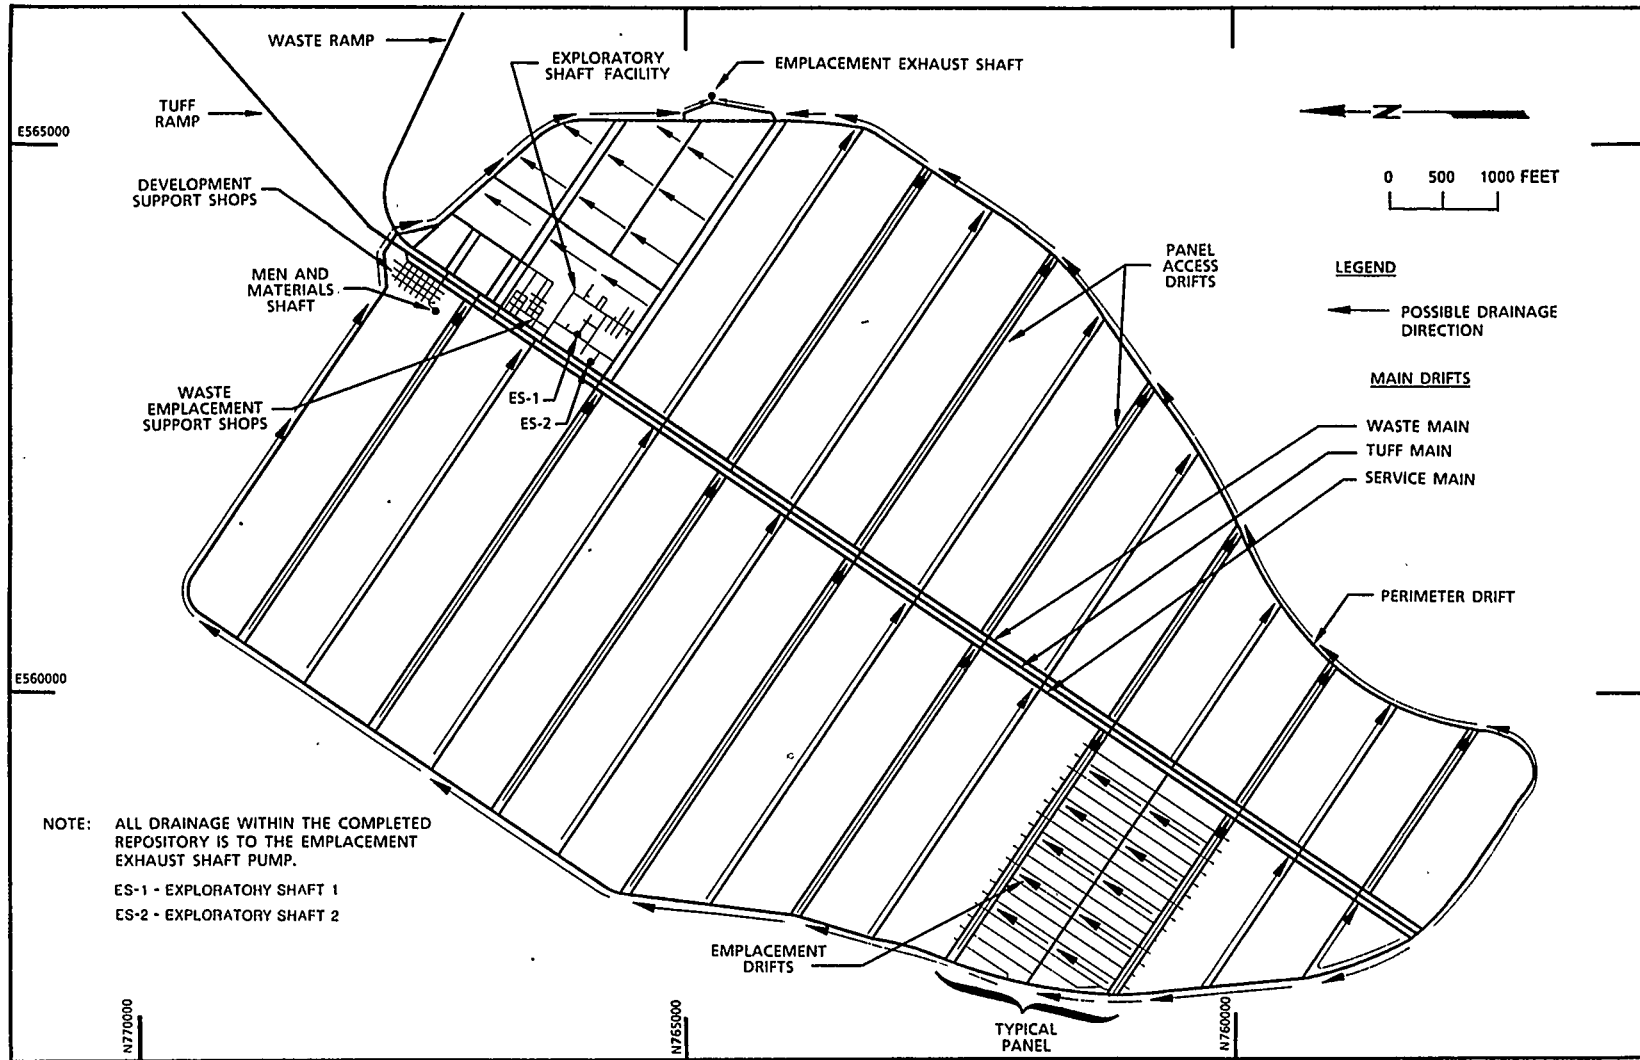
General underground facility layout showing drainage directions for vertical emplacement.
